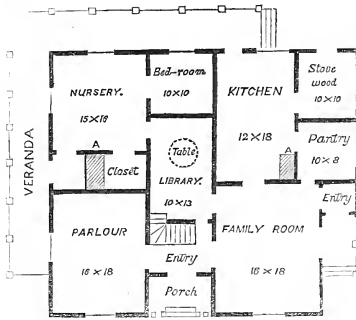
, 2, 3, represent the farm house—fig. 1, the elevation, partaking of the Italian style—fig. 2, the ground plan, and fig. 3, plan of the second floor. A form nearly square is given to the building, for the sake of economy, requiring far less external covering for the space enclosed; at the same time the outline is somewhat broken, to prevent heaviness and monotony of expression. About half is surrounded with a veranda, under which lathing and plastering may
